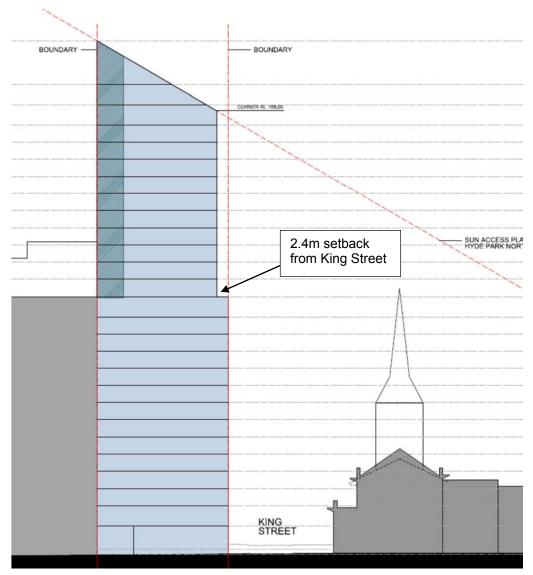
Western (Elizabeth Street) elevation of proposed envelope.
